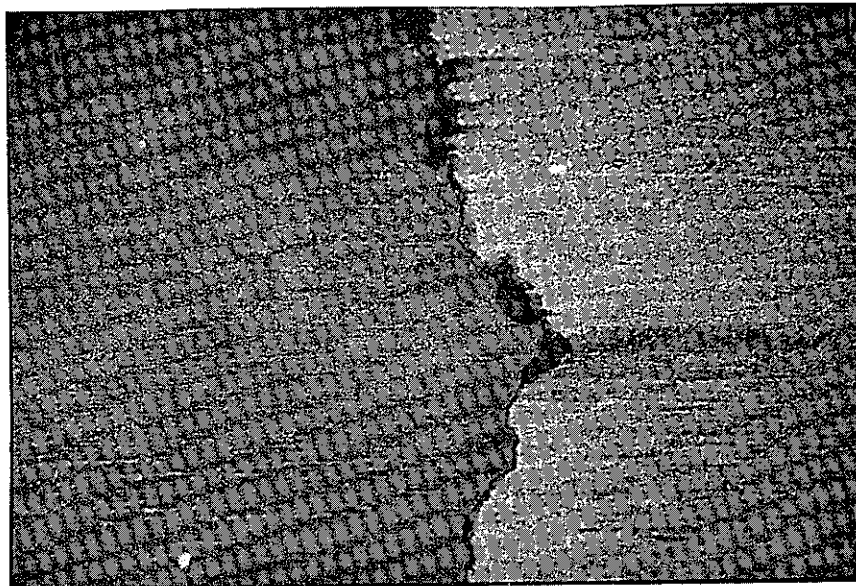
Open shrinkage crack in Taxiway B at Exit G; 1969 construction.
